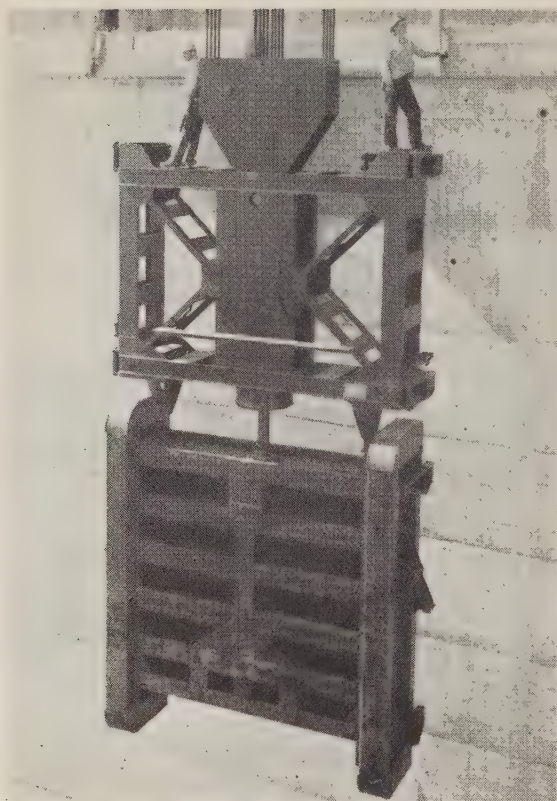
GANTRY CRANE IN USE WITH LIFTING MECHANISM AND OUTLET CONDUIT COASTER GATE SUSPENDED FROM 125-TON FIXED HOIST
